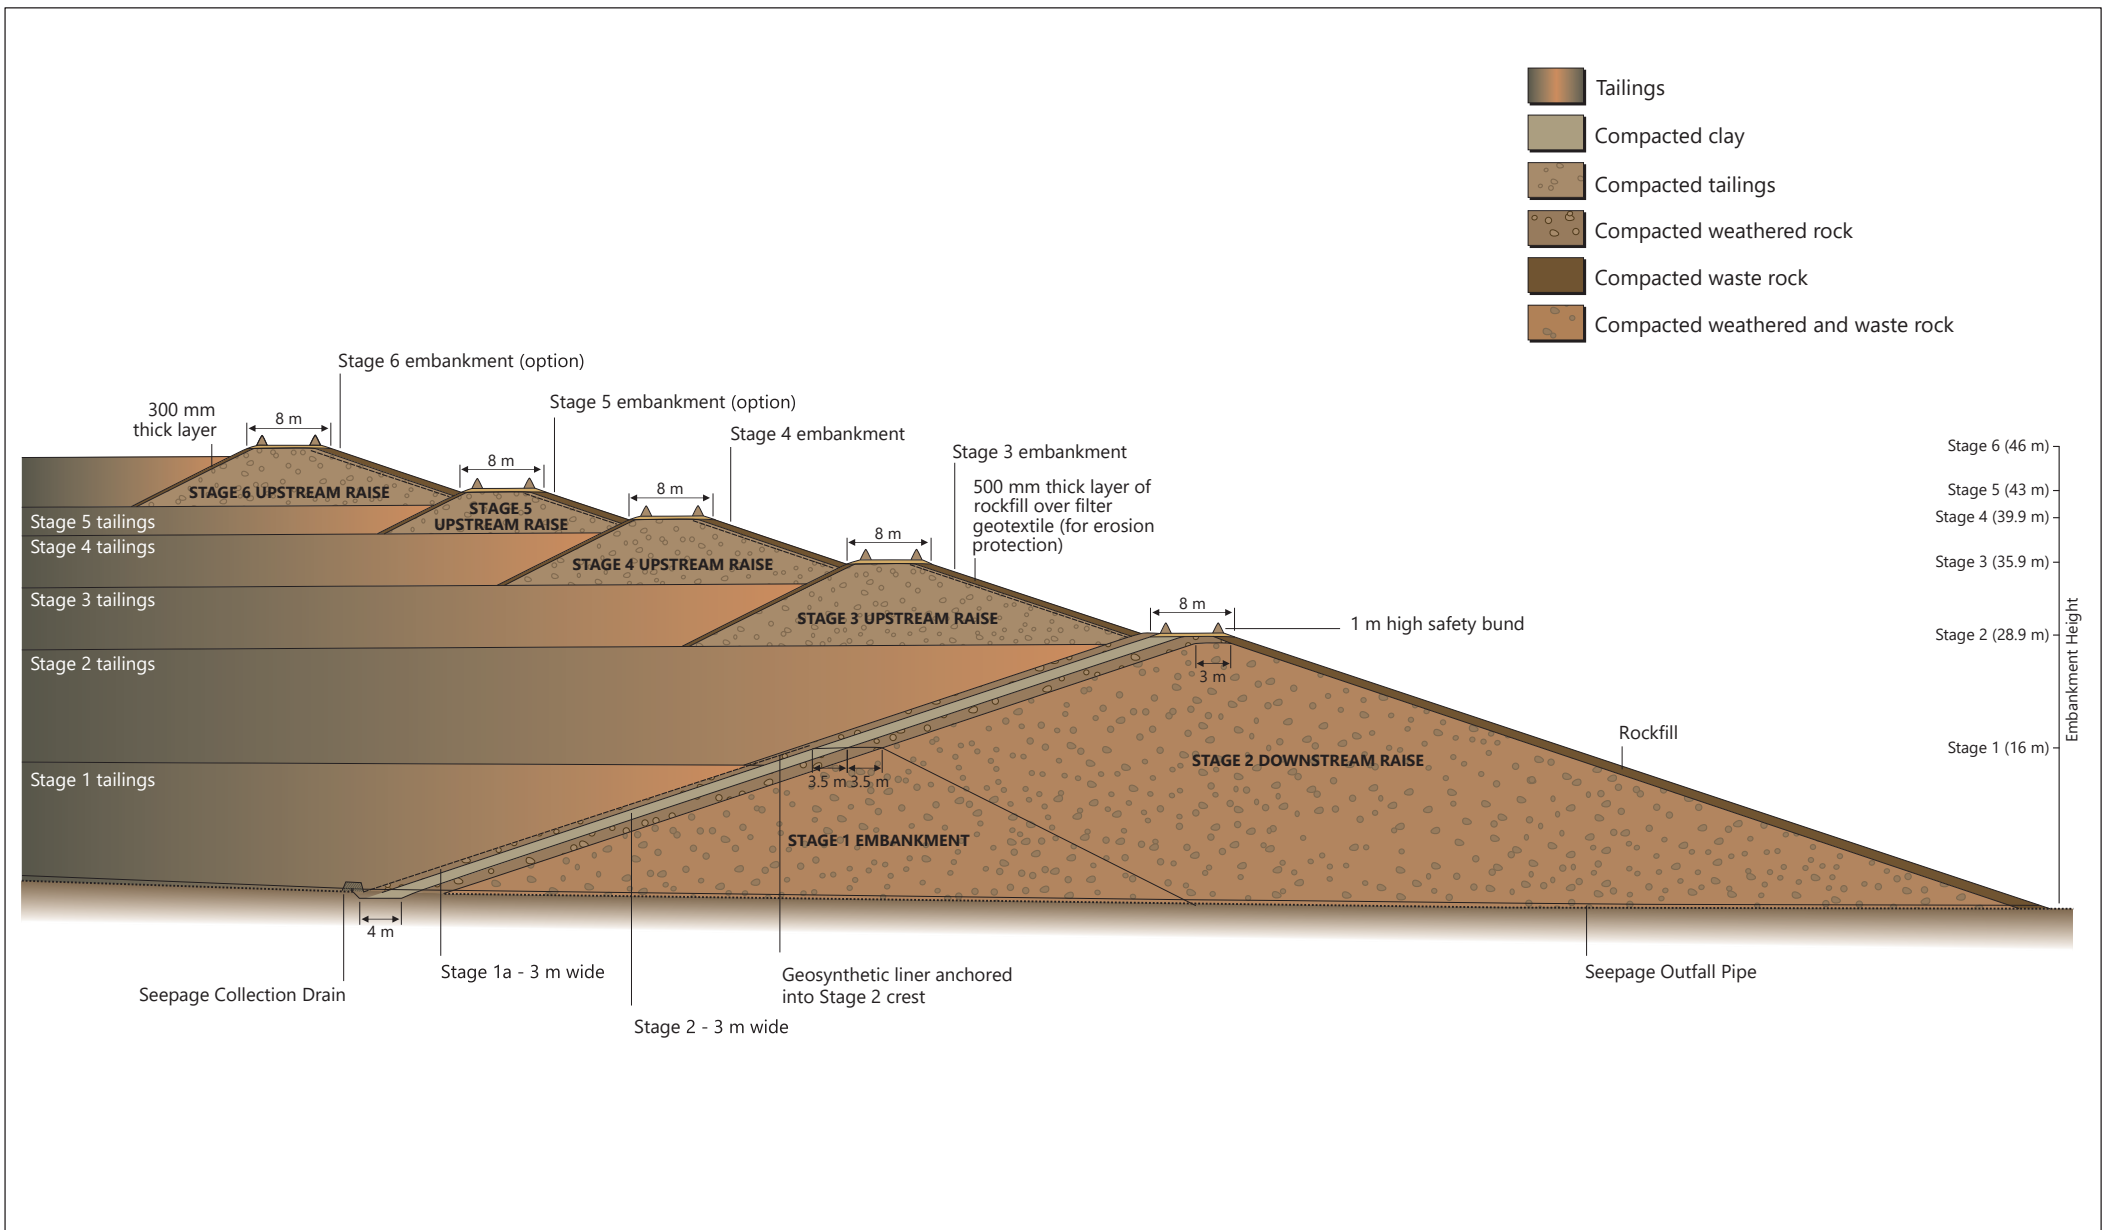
Tailings Storage Facility Embankment Cross-Section
